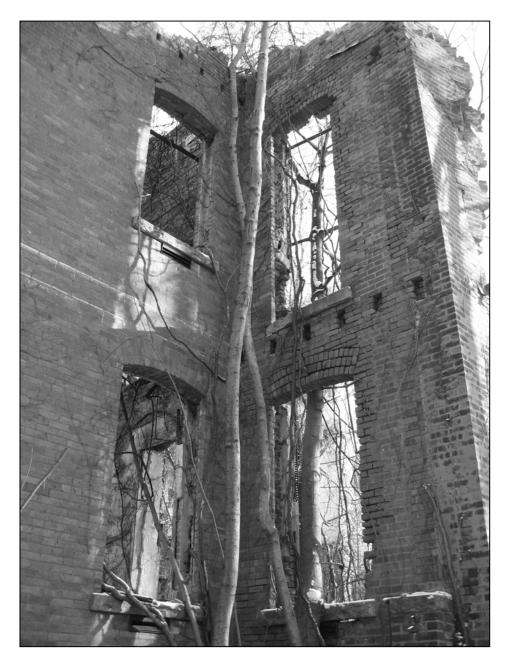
Interior of central pavilion, showing west wall detail, facing north-northwest.
